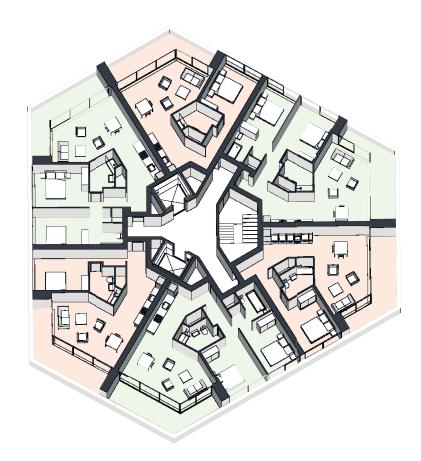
Typical floors provide six alternating 1 and 2 bed apartments per floor.
